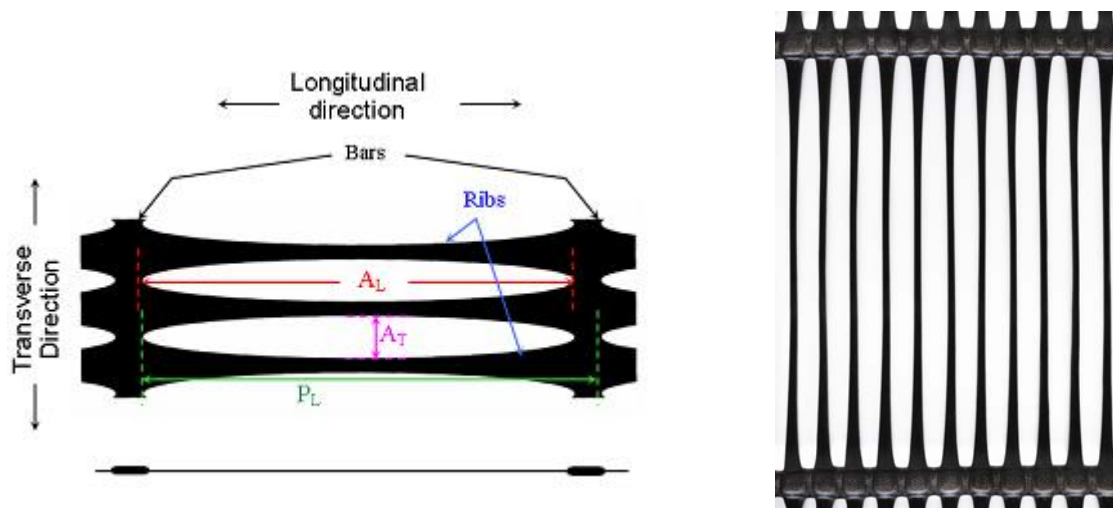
Elevation, plan and section of geogrids Tenax "TT SAMP",
